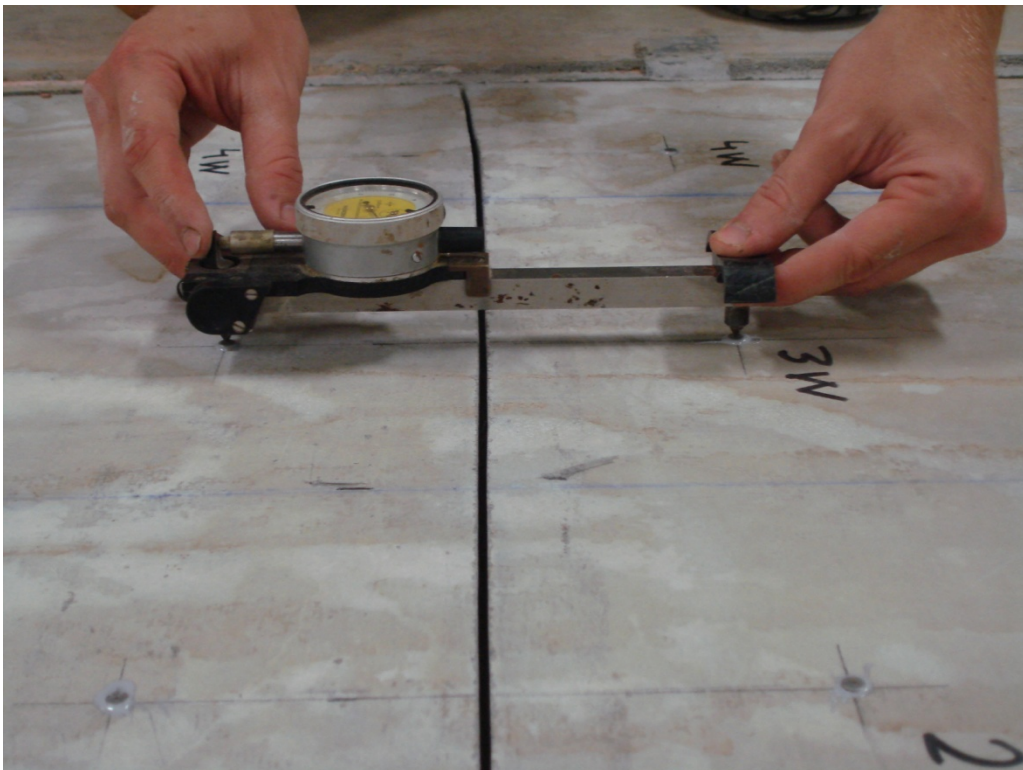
Monitoring Slab Shrinkage or Expansion with Demec Strain Gage
